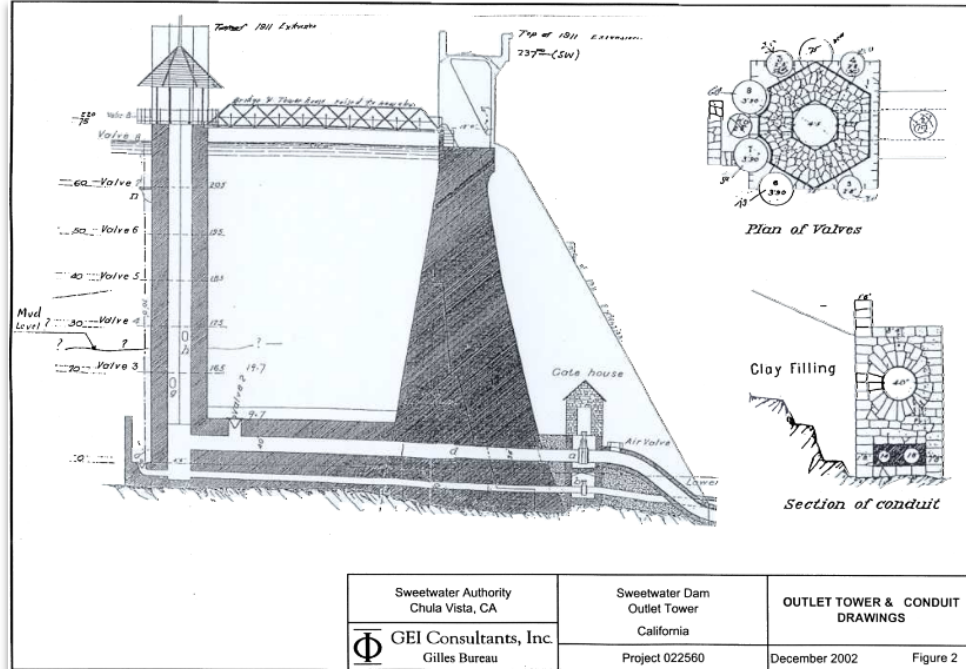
Sweetwater Dam Outlet Tower and Outlet Conduit
